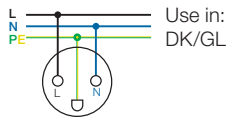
Socket outlet with earthing contact DENMARK - 2-pin + earth, 250 V~, 13 A
